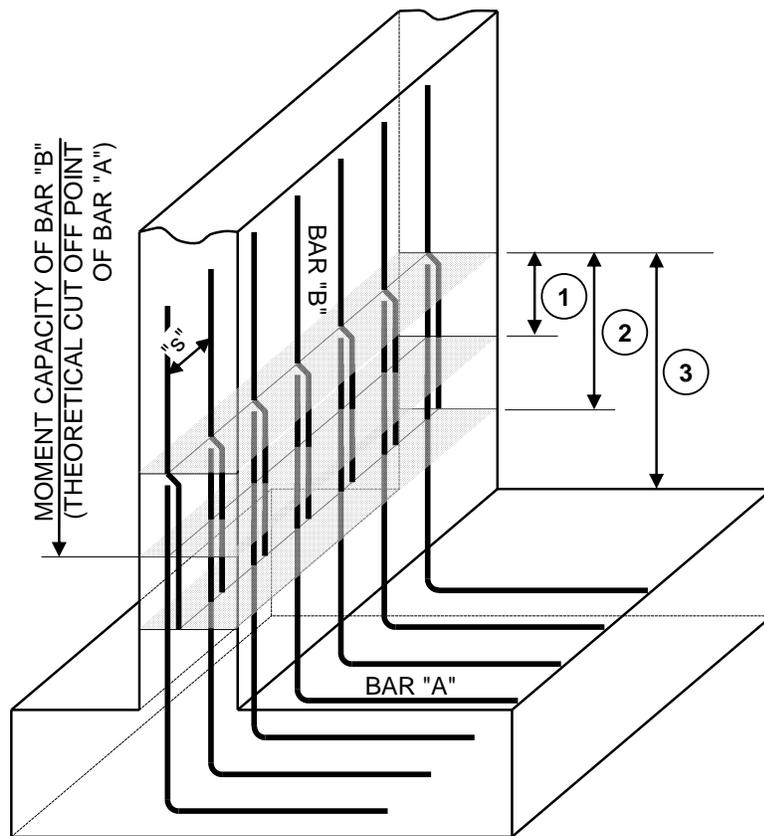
3 Cat. 3: Bars Spliced above the Footing
